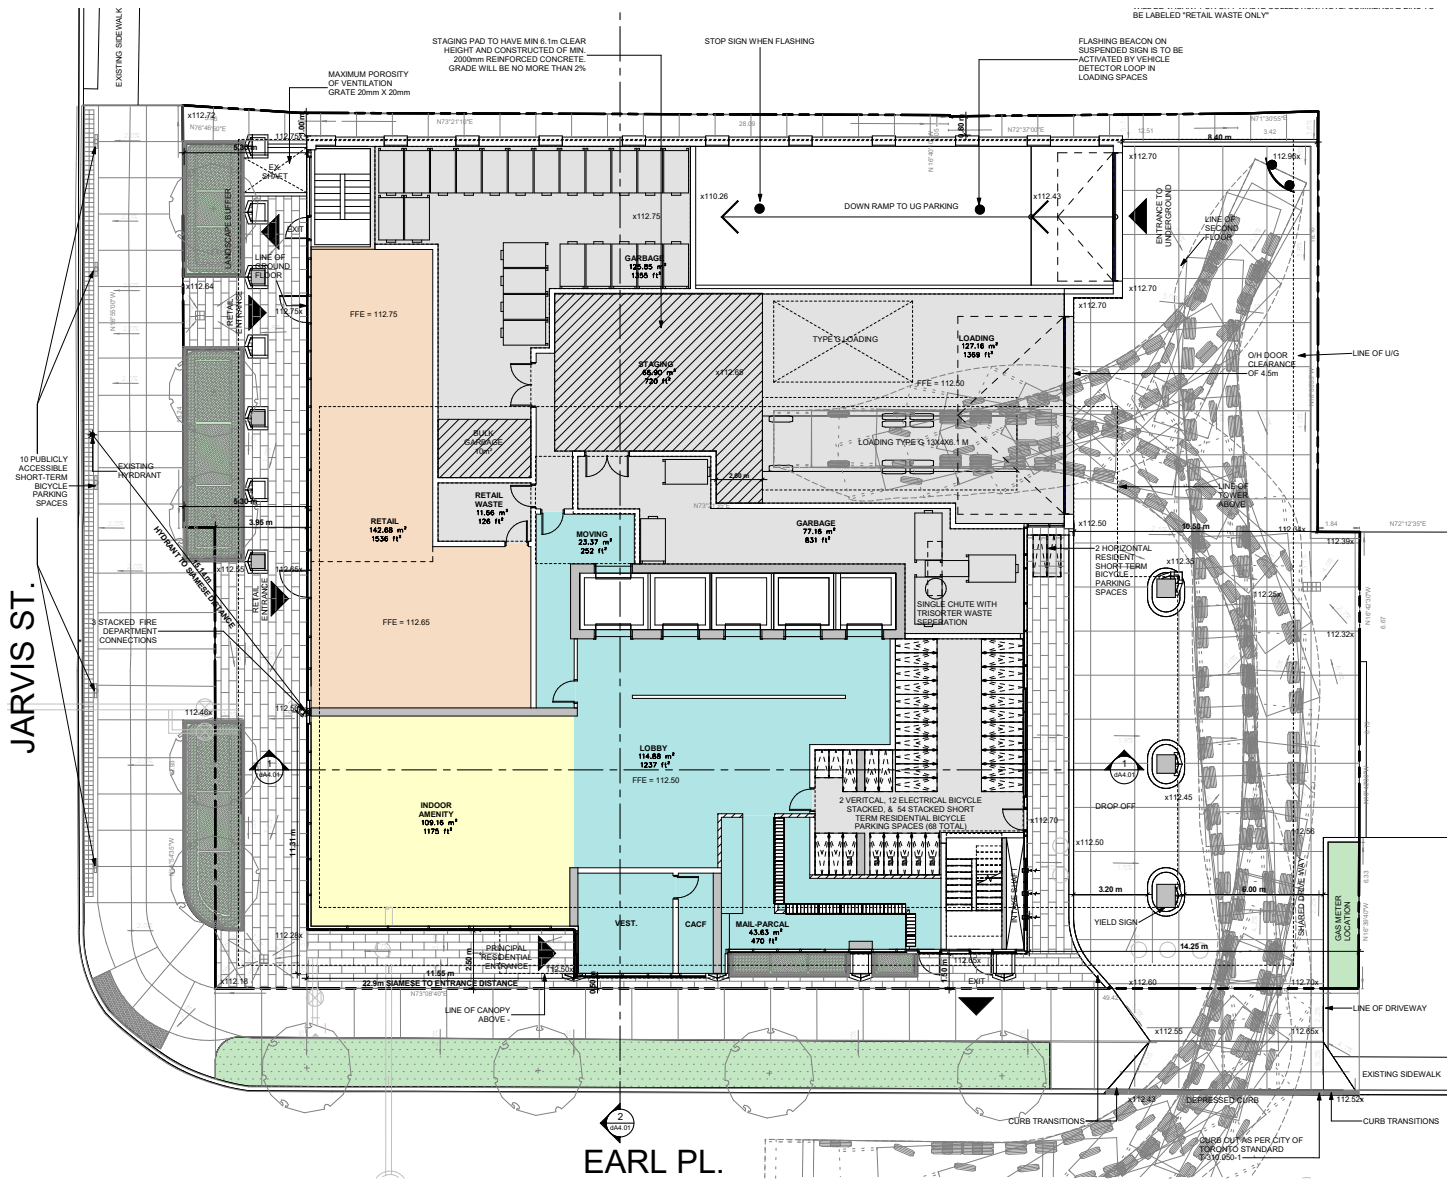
Ground Floor Plan (Provided by: Kirkor)
